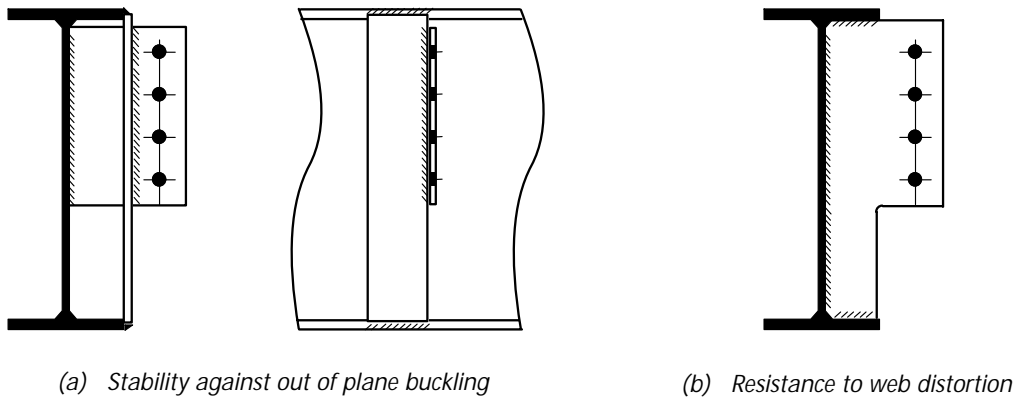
Possible stiffening arrangement for long fin plates to supporting beam
